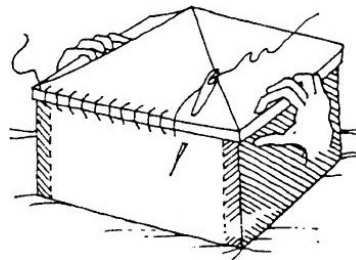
The effectiveness of structural connections provides box-type behavior to the building.
